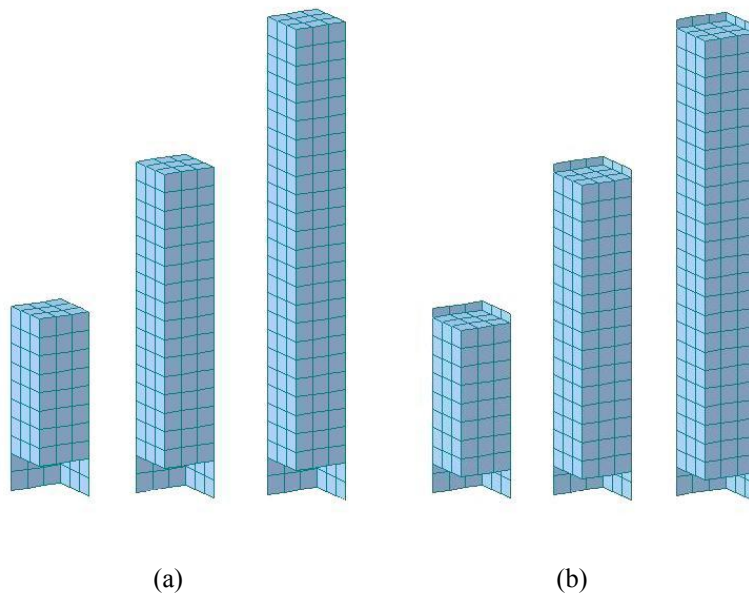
Deformed and undeformed geometries of Shakir-Khalil's test specimens with 200, 400 and 600mm interface lengths ; (a) undeformed geometry (b) deformed geometry
